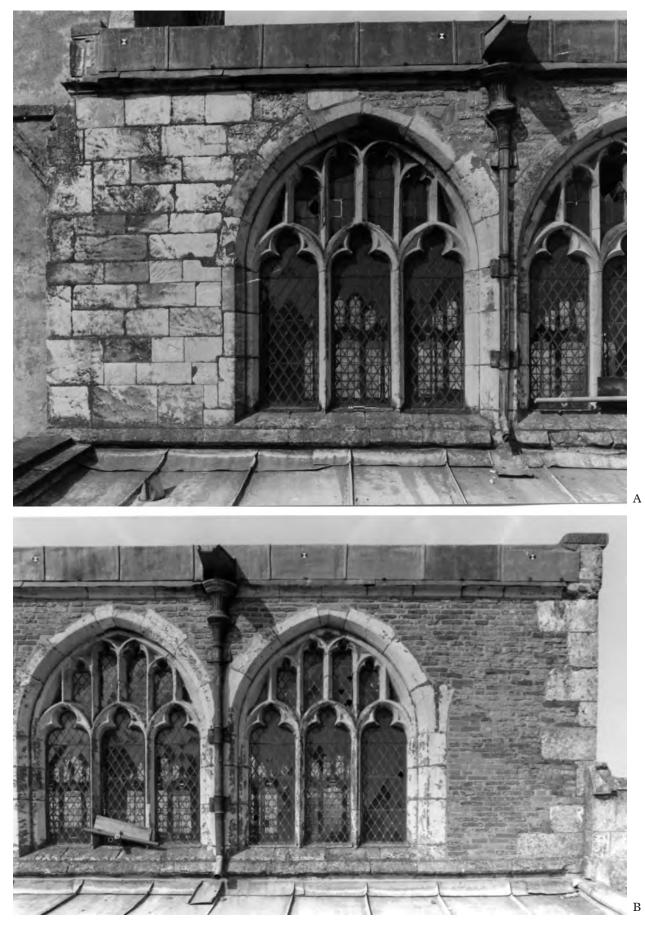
South clerestory. A, Bay 9 (west); B, Bay 1 (east); showing windows and adjoining nibs of brickwork and ashlar masonry, 1980. Note also the springing for an unbuilt tenth bay to the east. Photos: Warwick Rodwell
